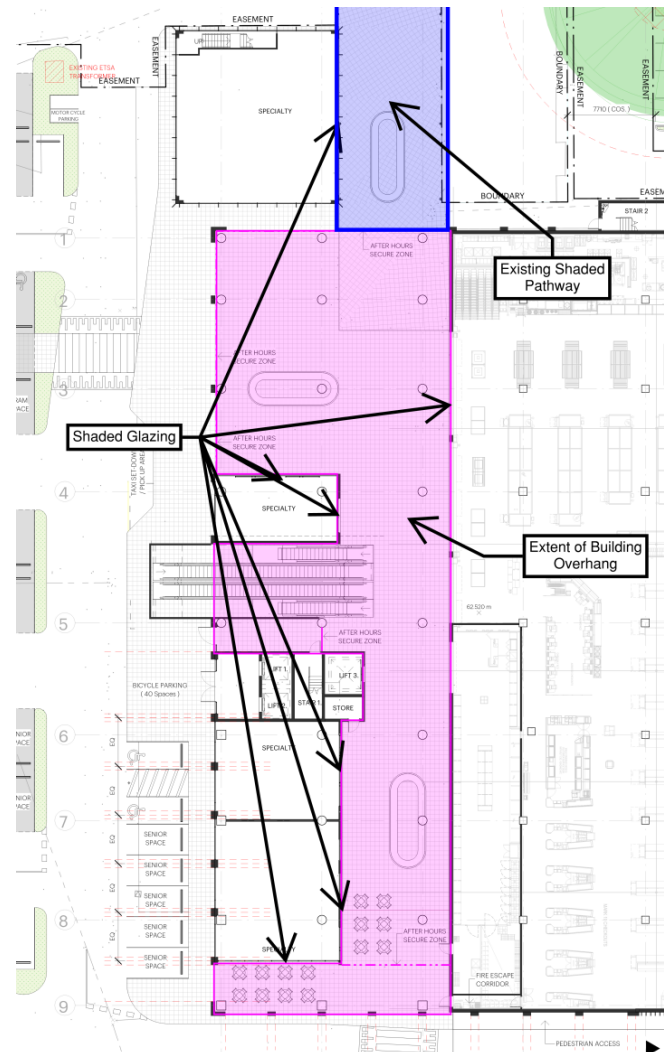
Shading due to Building Overhang – Ground Floor (Image courtesy of Studio Nine Architects)
